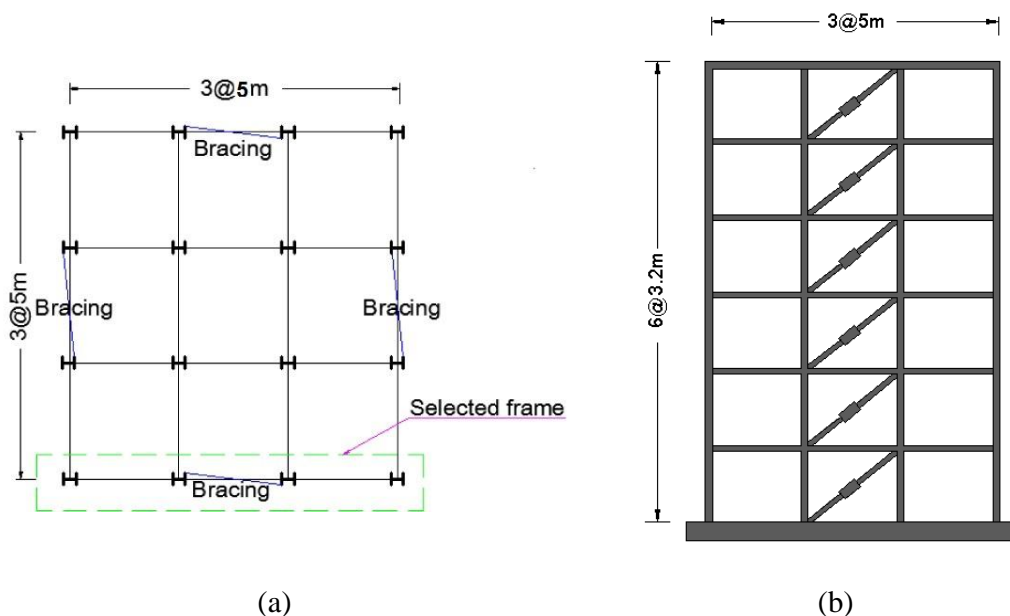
6-storey frame(a)Plan of the buildings and (b) elevation
